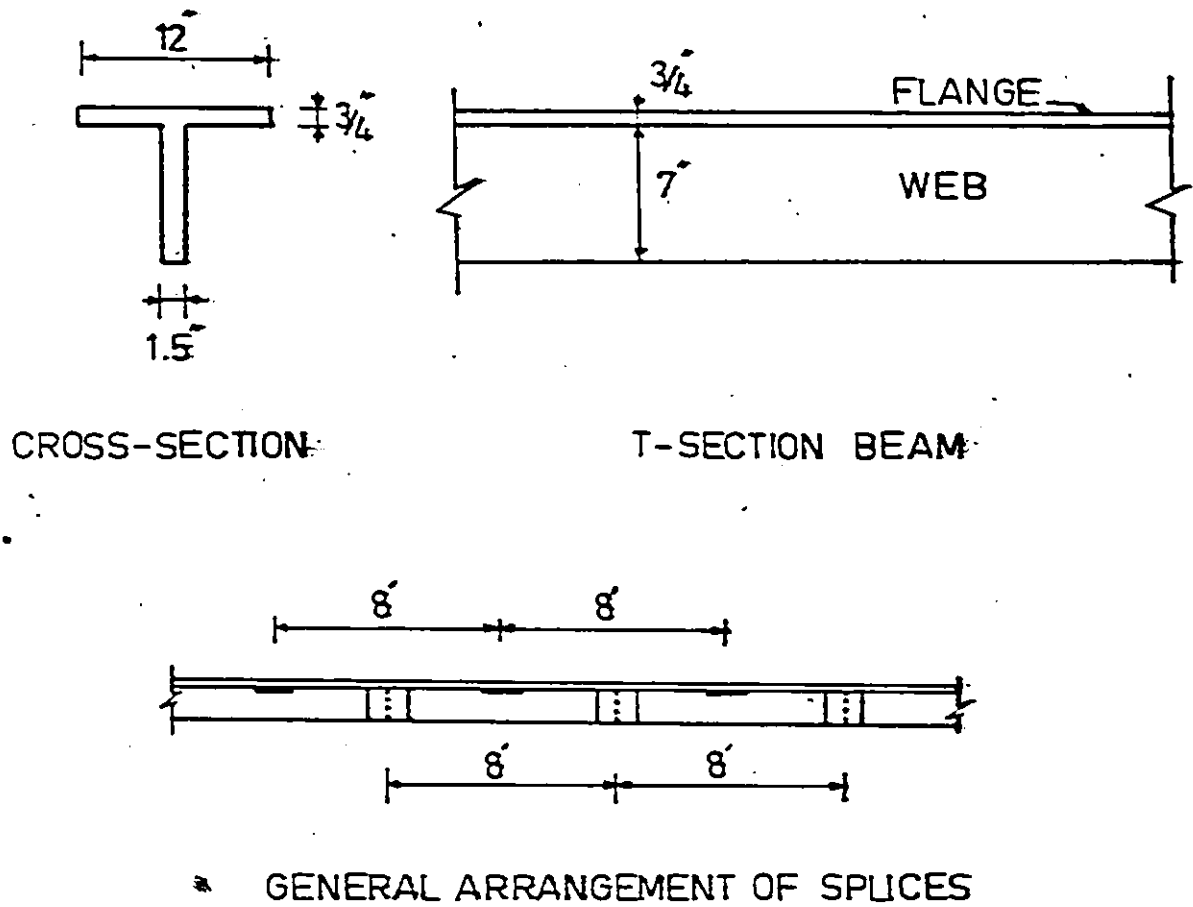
Details for the Continuous T-Section Beam Carrying the Plexiglass Pipe
